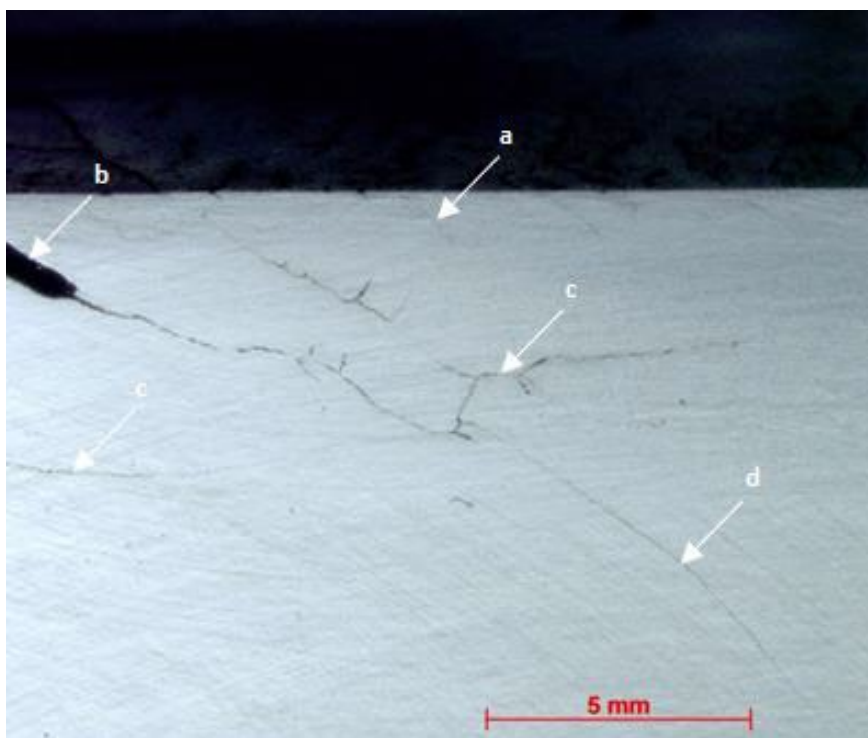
The image shows an axial cut along the rail head, between fracture surface 11.2 and 12.1, with surface fatigue cracks (a), spalls (b), parallel cracks (c) and an early stage of a vertical crack (d).
